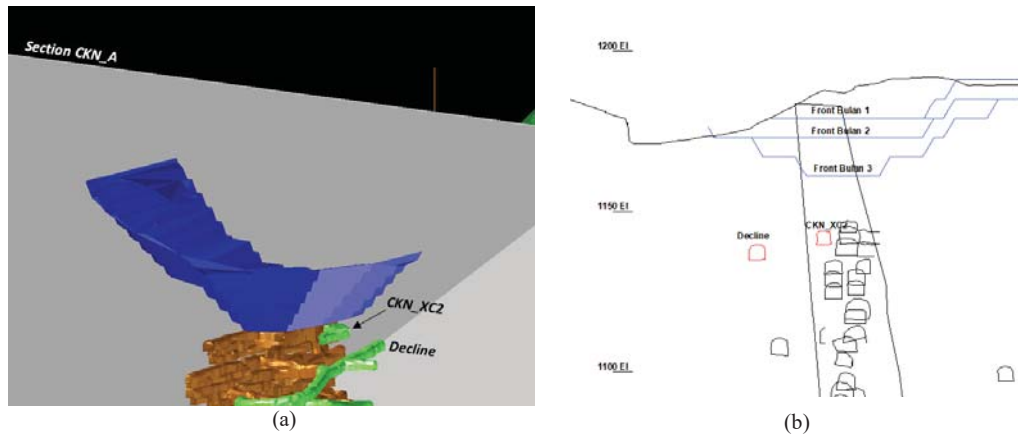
The Underground Condition as (A) 3d View (B) Section View
